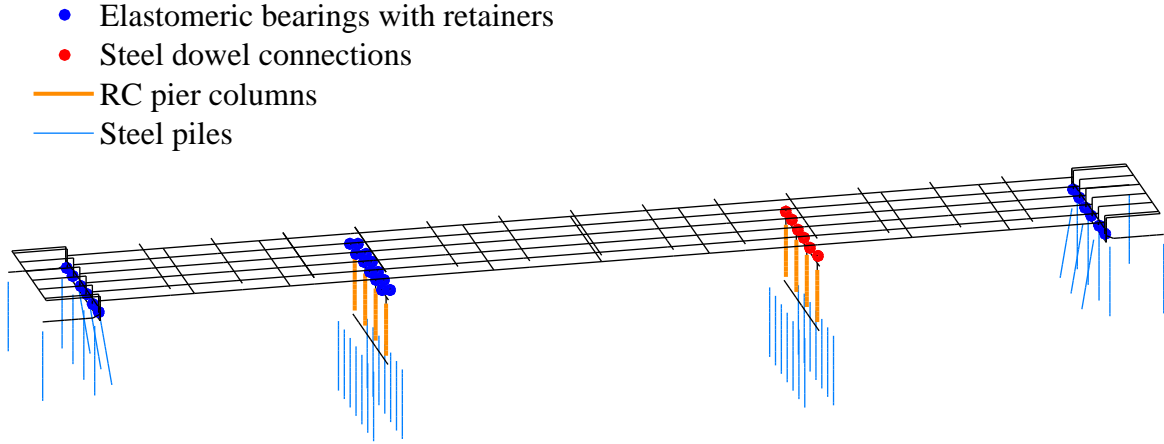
3-D finite-element model of 3C00P15H bridge
